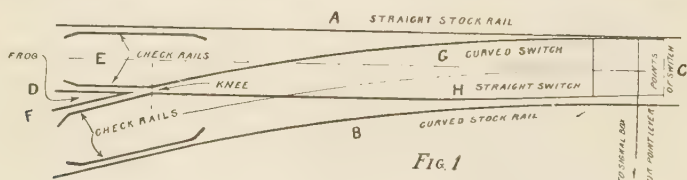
NAMES OF PARTS OF STANDARD POINTS.
